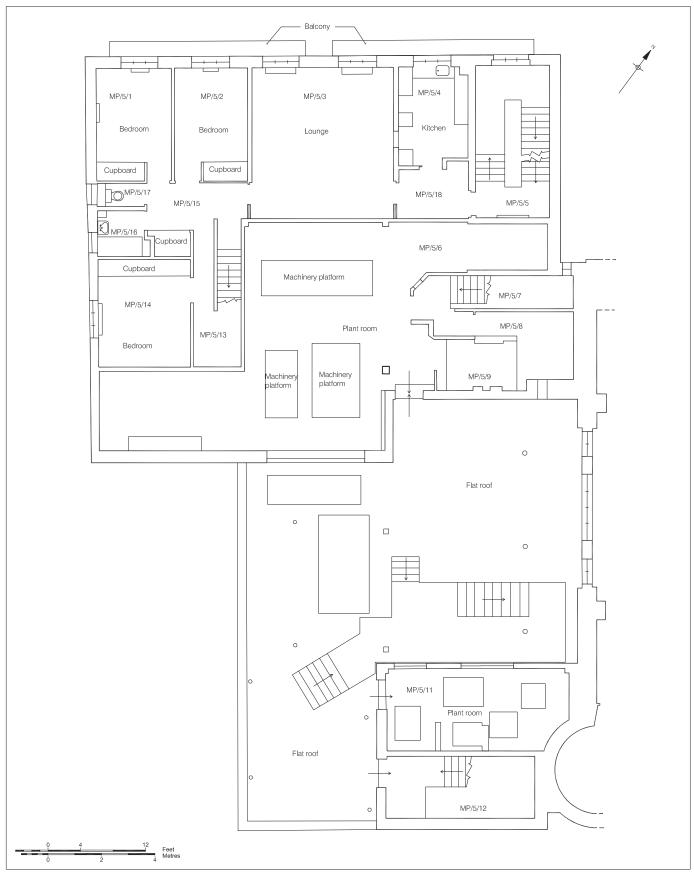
Third Floor Plan 1-2 Montague Place British Museum 1:100 at A3
